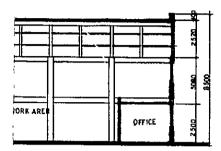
Standard Factory Building Type A, Sectional Detail
